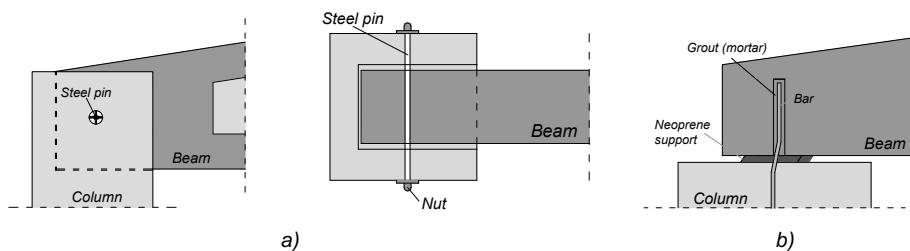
a) Beam-to-column connection with steel pin adopted in the finite element model; b) different solution of the beam-to-column connection provided by [Doneux *et al.*, 2006].
